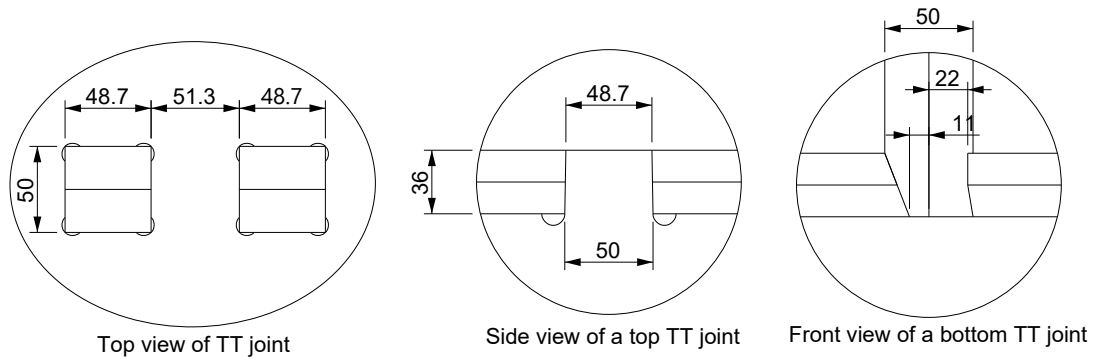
Detailed plan of the top and bottom TT geometry of the case-study roof element.
